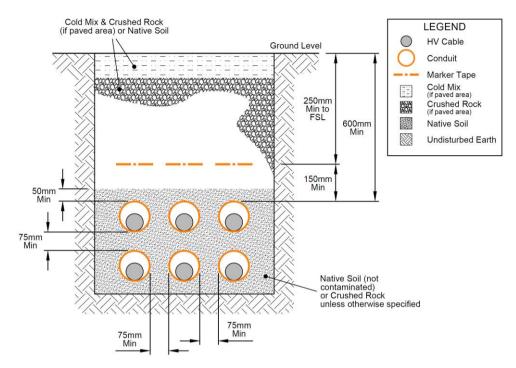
Typical Trench Section - 600mm Minimum Cable Burial Depth (6 conduits shown)
